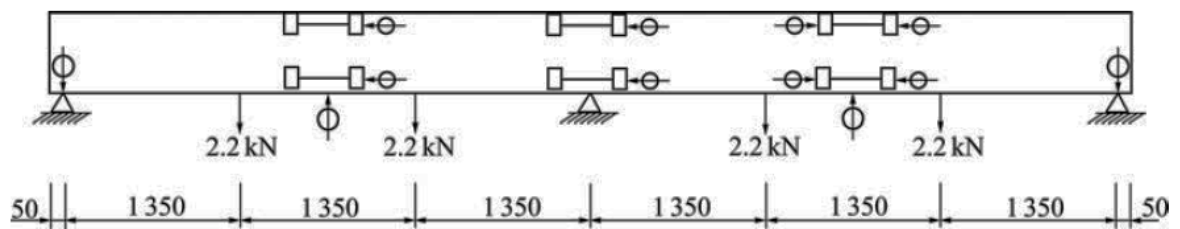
Layout of measuring points of simple beam (unit: mm) (Xiao-jie et al., 2008)
